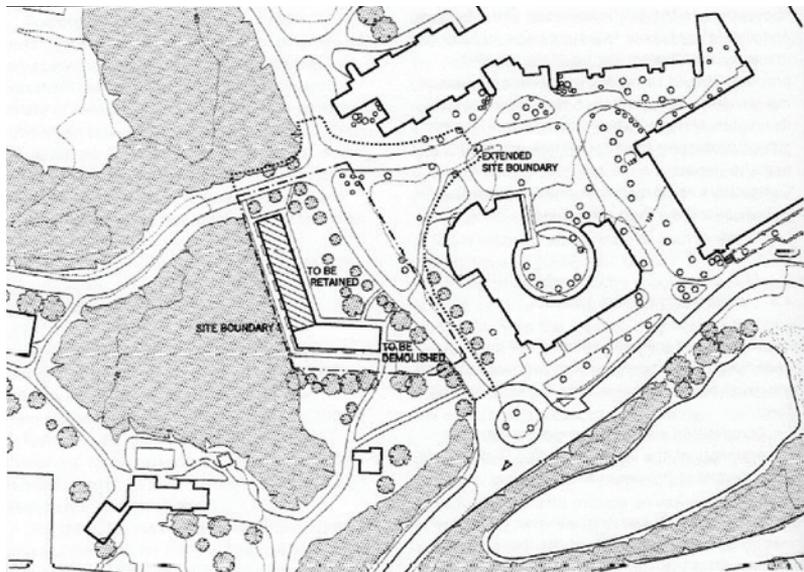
Site plan showing existing buildings before construction, including plans for partial demolition of the Crossroads building. Kohn Shnier Architects. Toronto.
